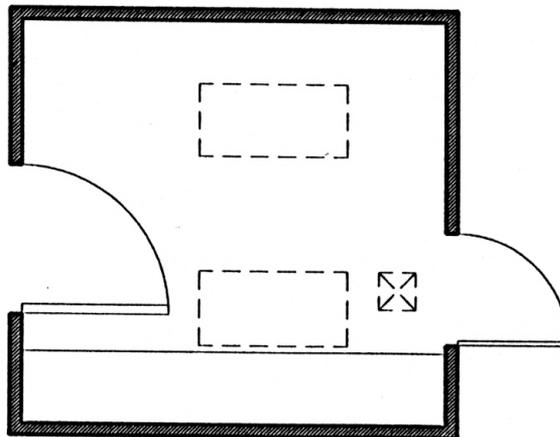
Plan of Skilled Care Work Area - Site 3.
